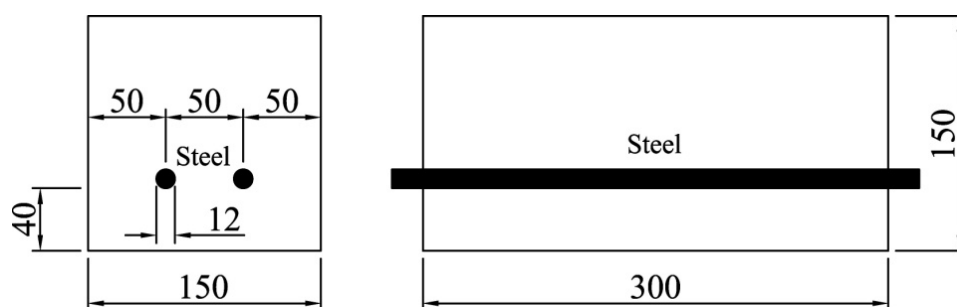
Schematic of the reinforced concrete specimen (dimensions are in mm)
